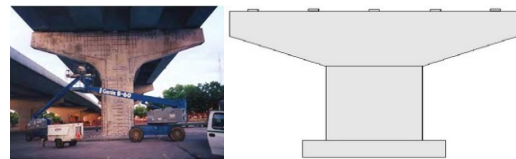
Typical hammerhead bridge pier (WisDOT Bridge Manual)
